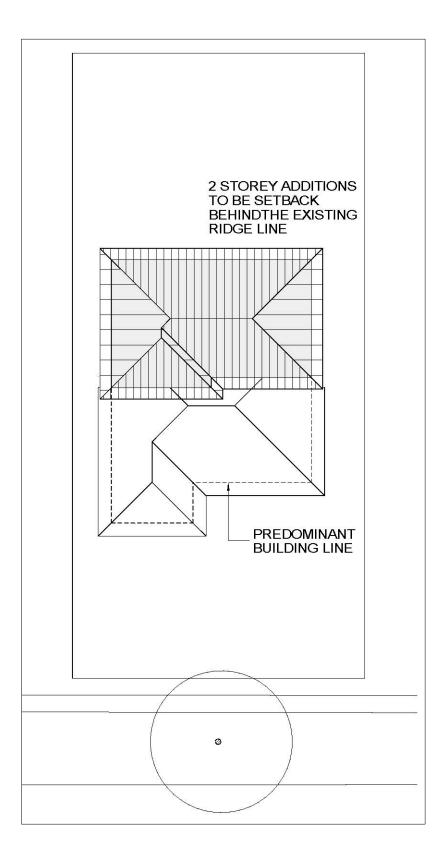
Plan Showing Second Storey Addition to Traditional House
